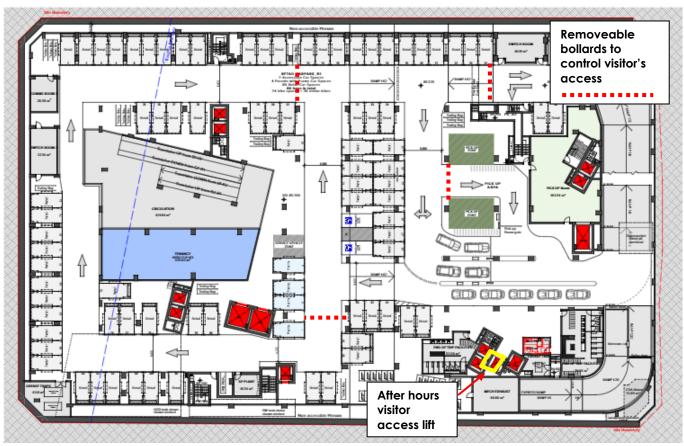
Extract from proposed Basement 1 Plan identifying bollard locations
